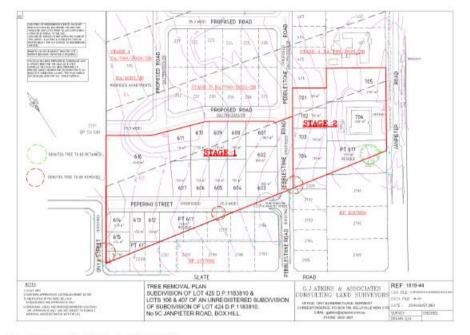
Proposed subdivision plan (949/2022/ZB)
